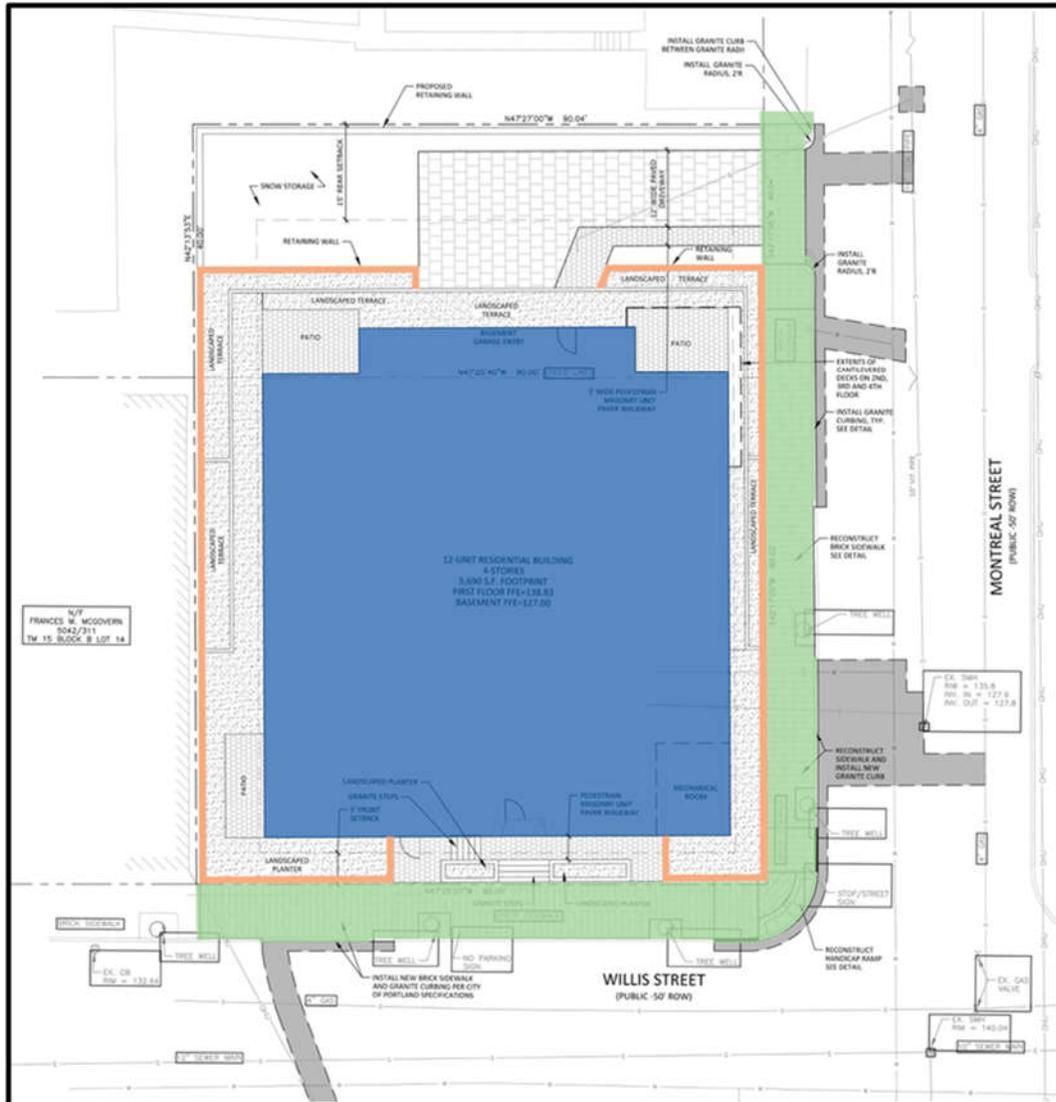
December 3, 2021 version of plan sheet C1.0 (“Proposed Site Plan”). AR. 113. The plan sheet has been cropped and a color overlay has been superimposed thereon to draw the Court’s attention to the enclosed building footprint itself (in blue), the surrounding elevated patio amenities (in orange) and the sidewalks on the Willis Street and Montreal Street sides of the subject property (in green).
